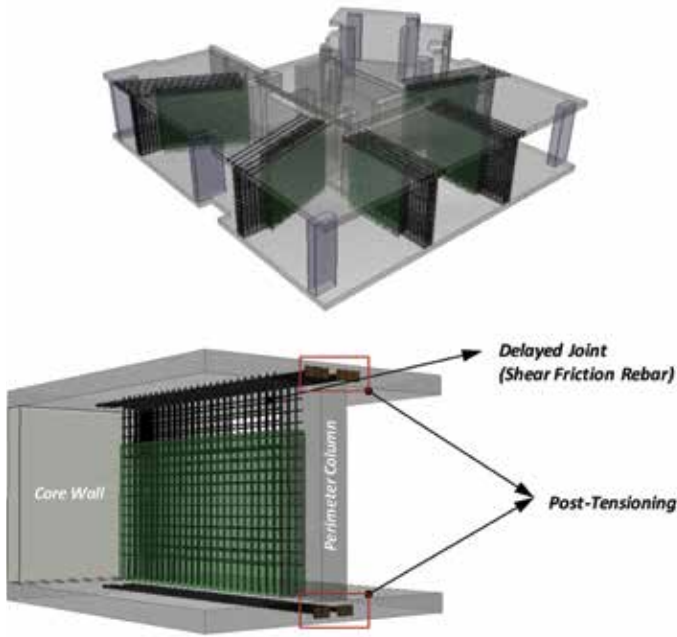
Outrigger wall with post-tensioned slab (OW+PTS) system.
